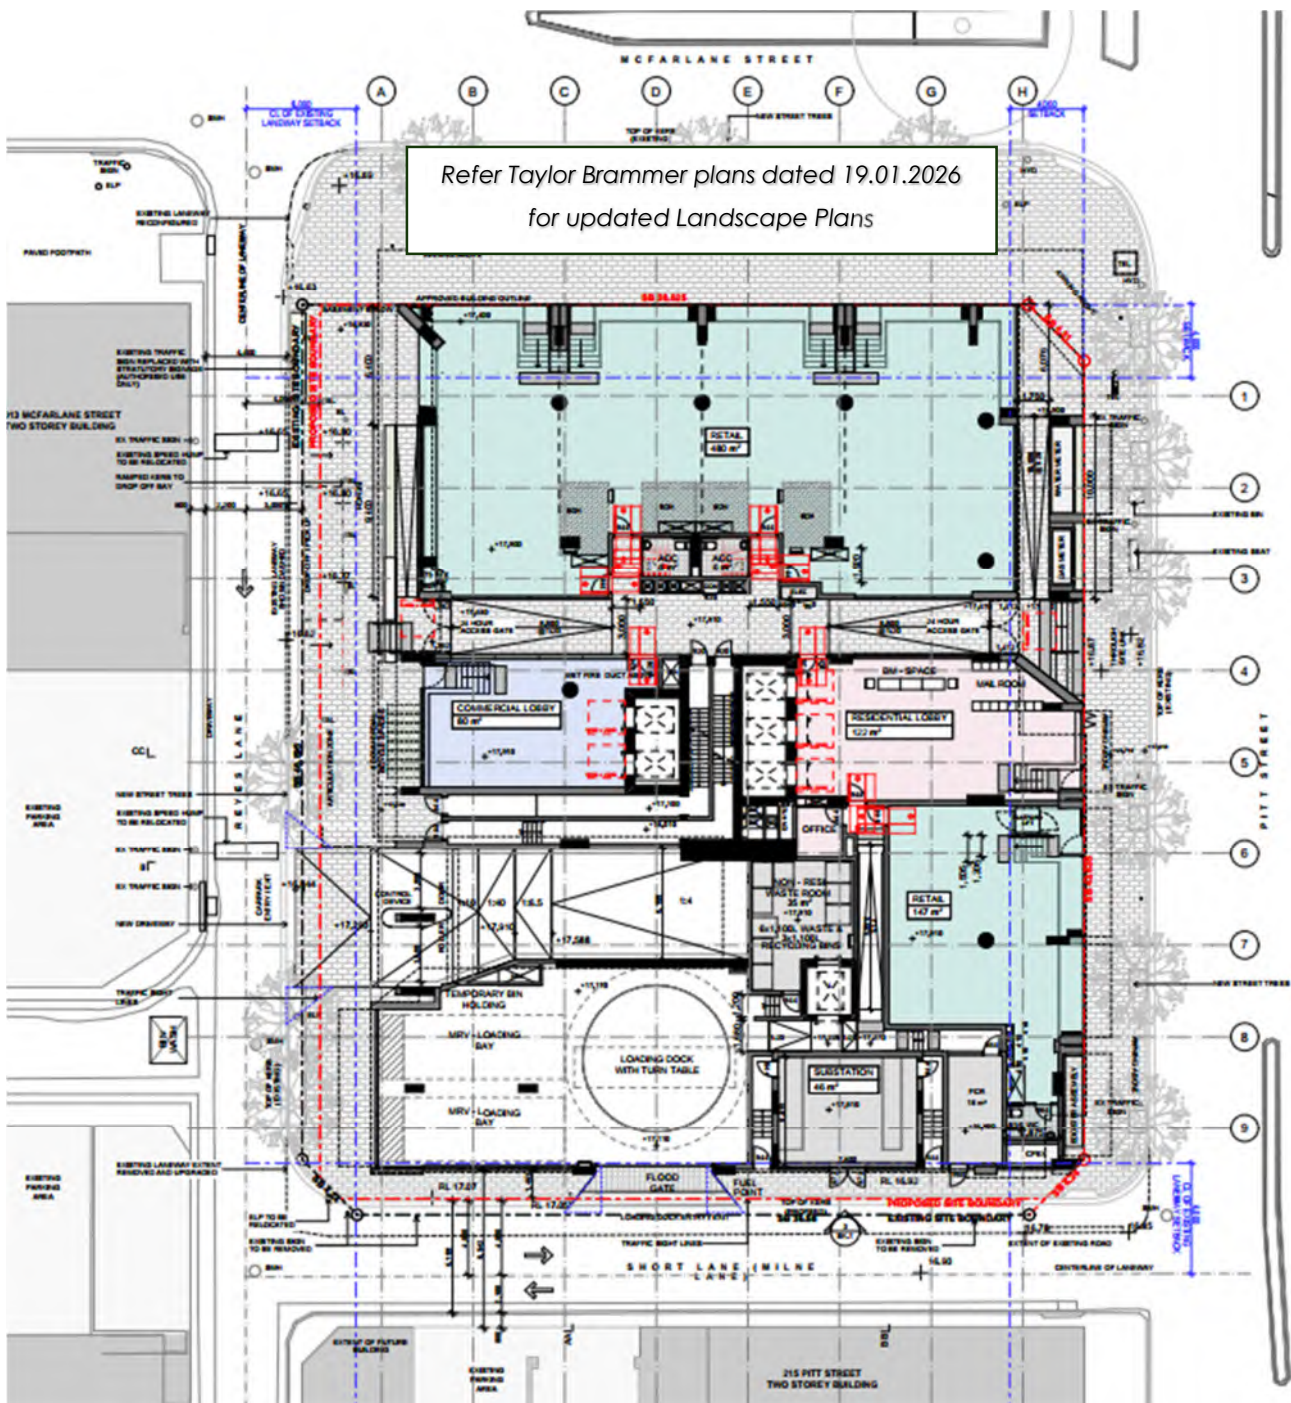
Ground Floor Plan extract showing the layout of the proposed development within the subject site.
